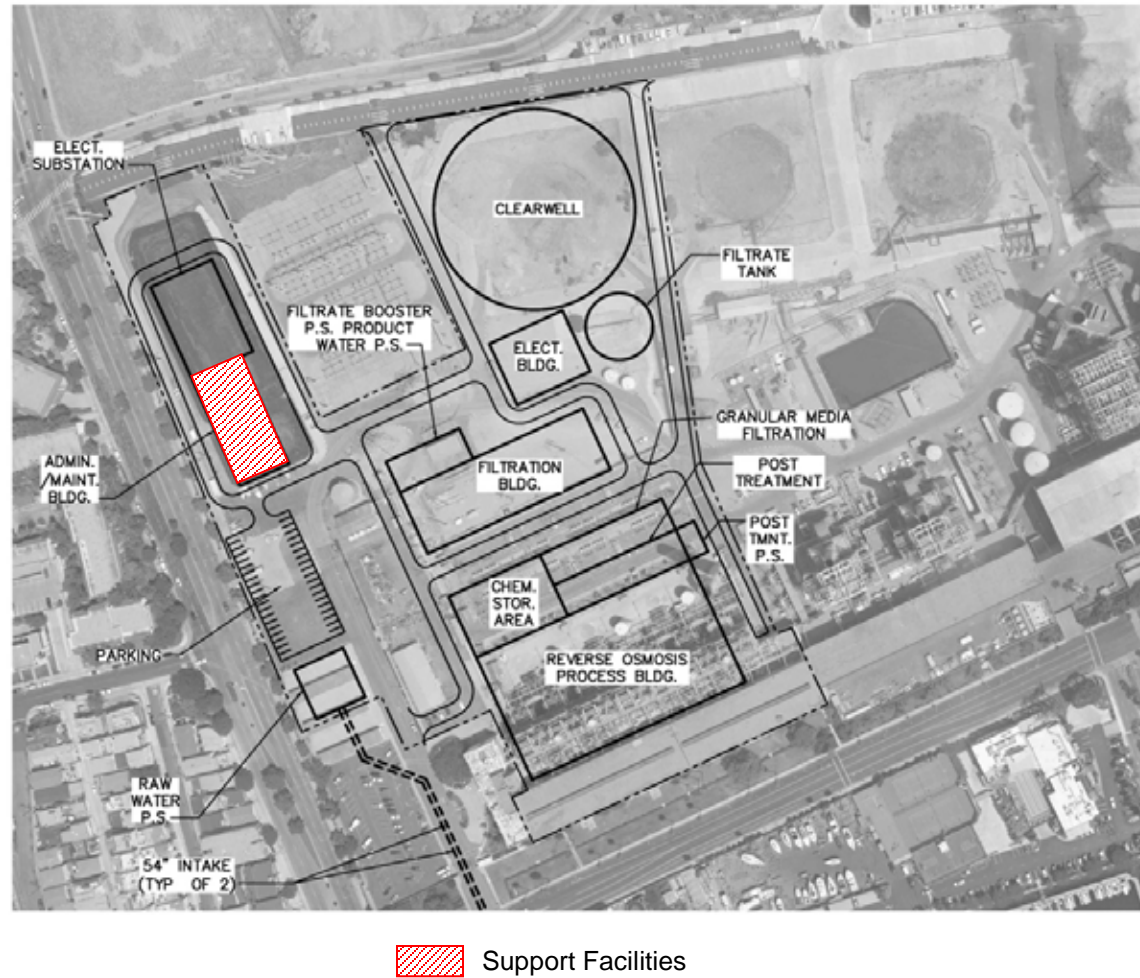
NRG Preliminary Site Layout – 60 MGD Support Facilities
